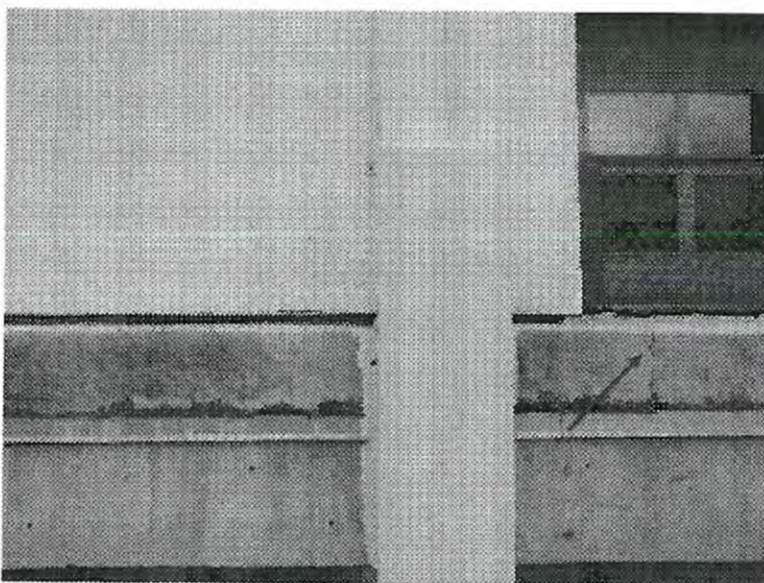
Crack between Buildings A and B at west elevation; note lack of building expansion joint in this location.
